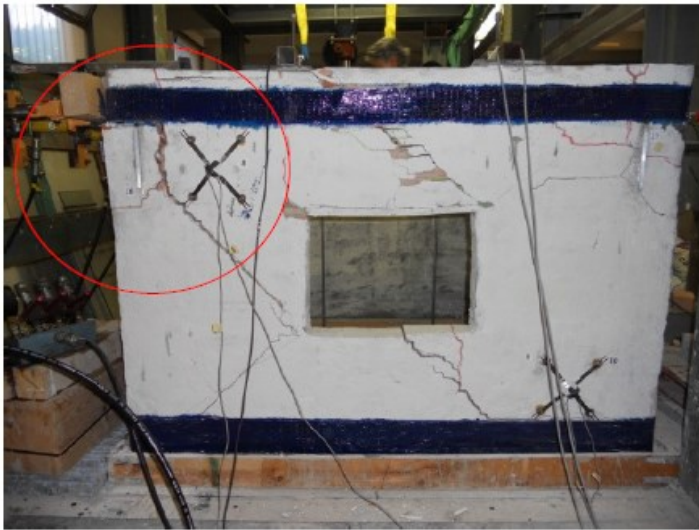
Cracks on the hollow wall and FRP delamination above the opening at the end of the fourth test.
